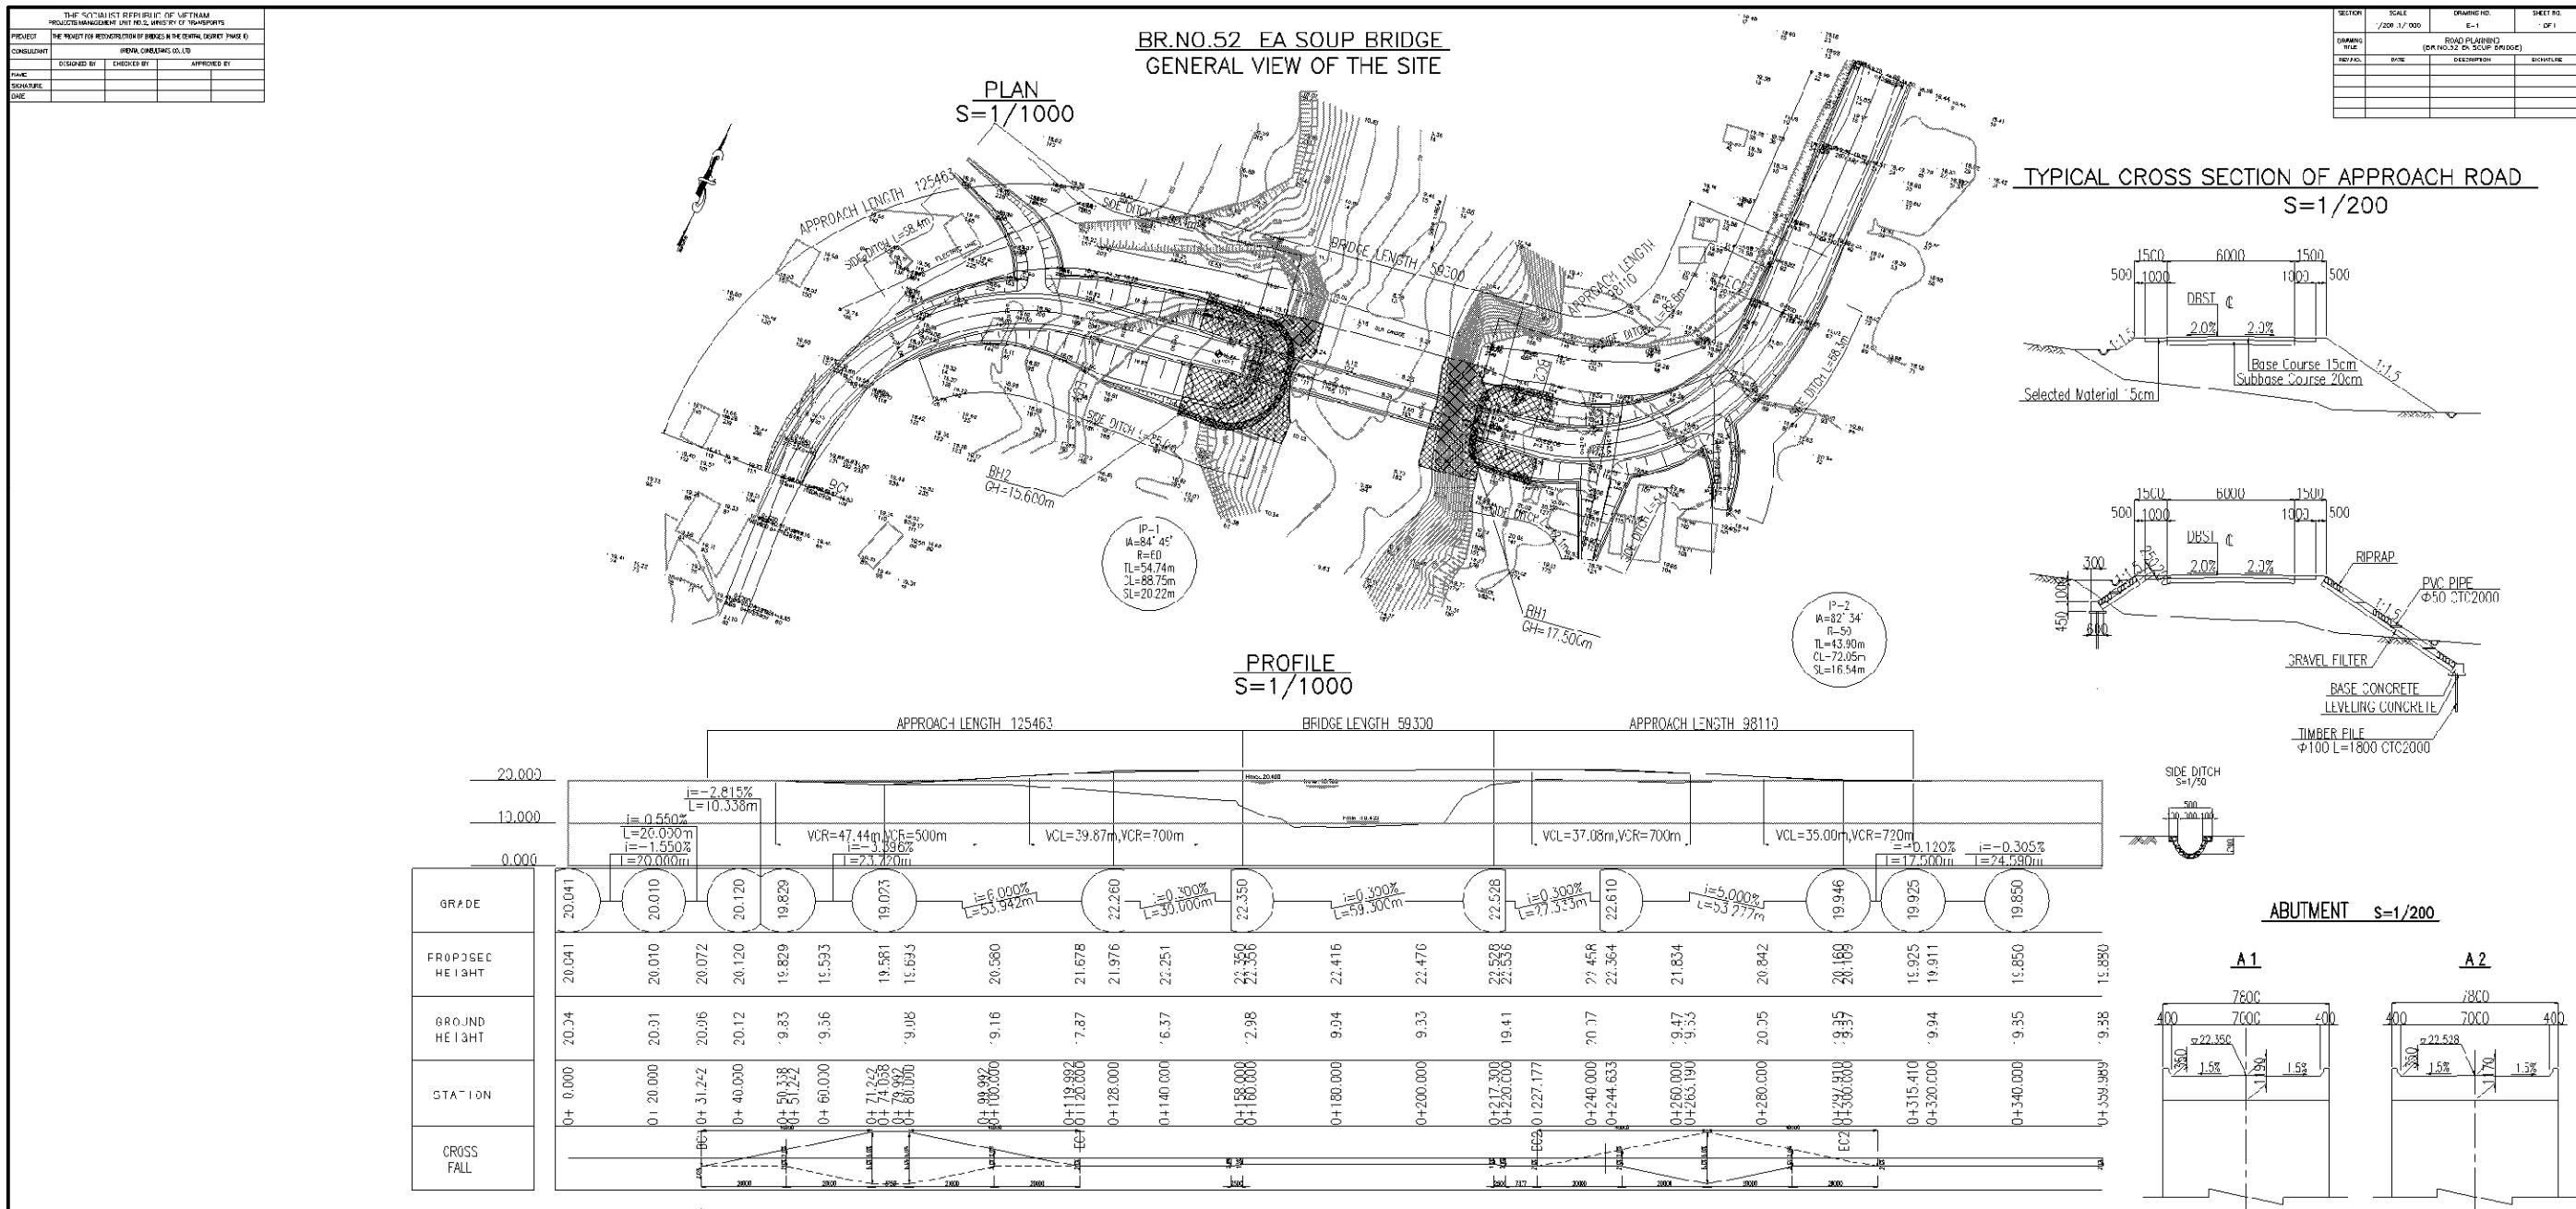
Ea Suop Bridge (General View throughout Site)
